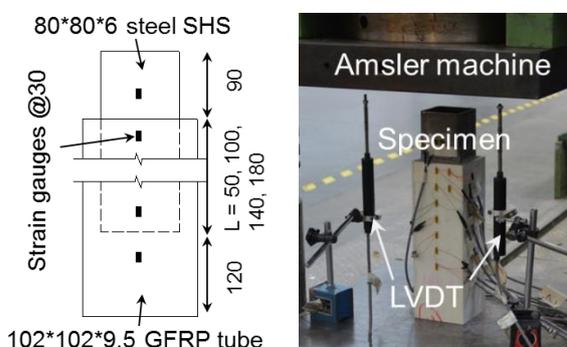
Geometries of BSJ specimens (left, units in mm) and test setup (right)
